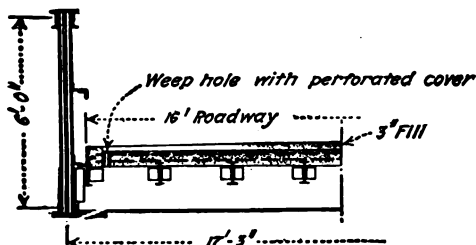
Concrete slab floor for highway steel-truss span, Iowa Highway Commission.
